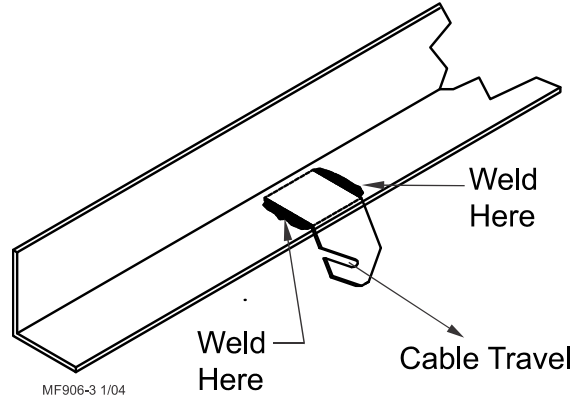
Welded Steel Truss Ceiling Bracket Installation
